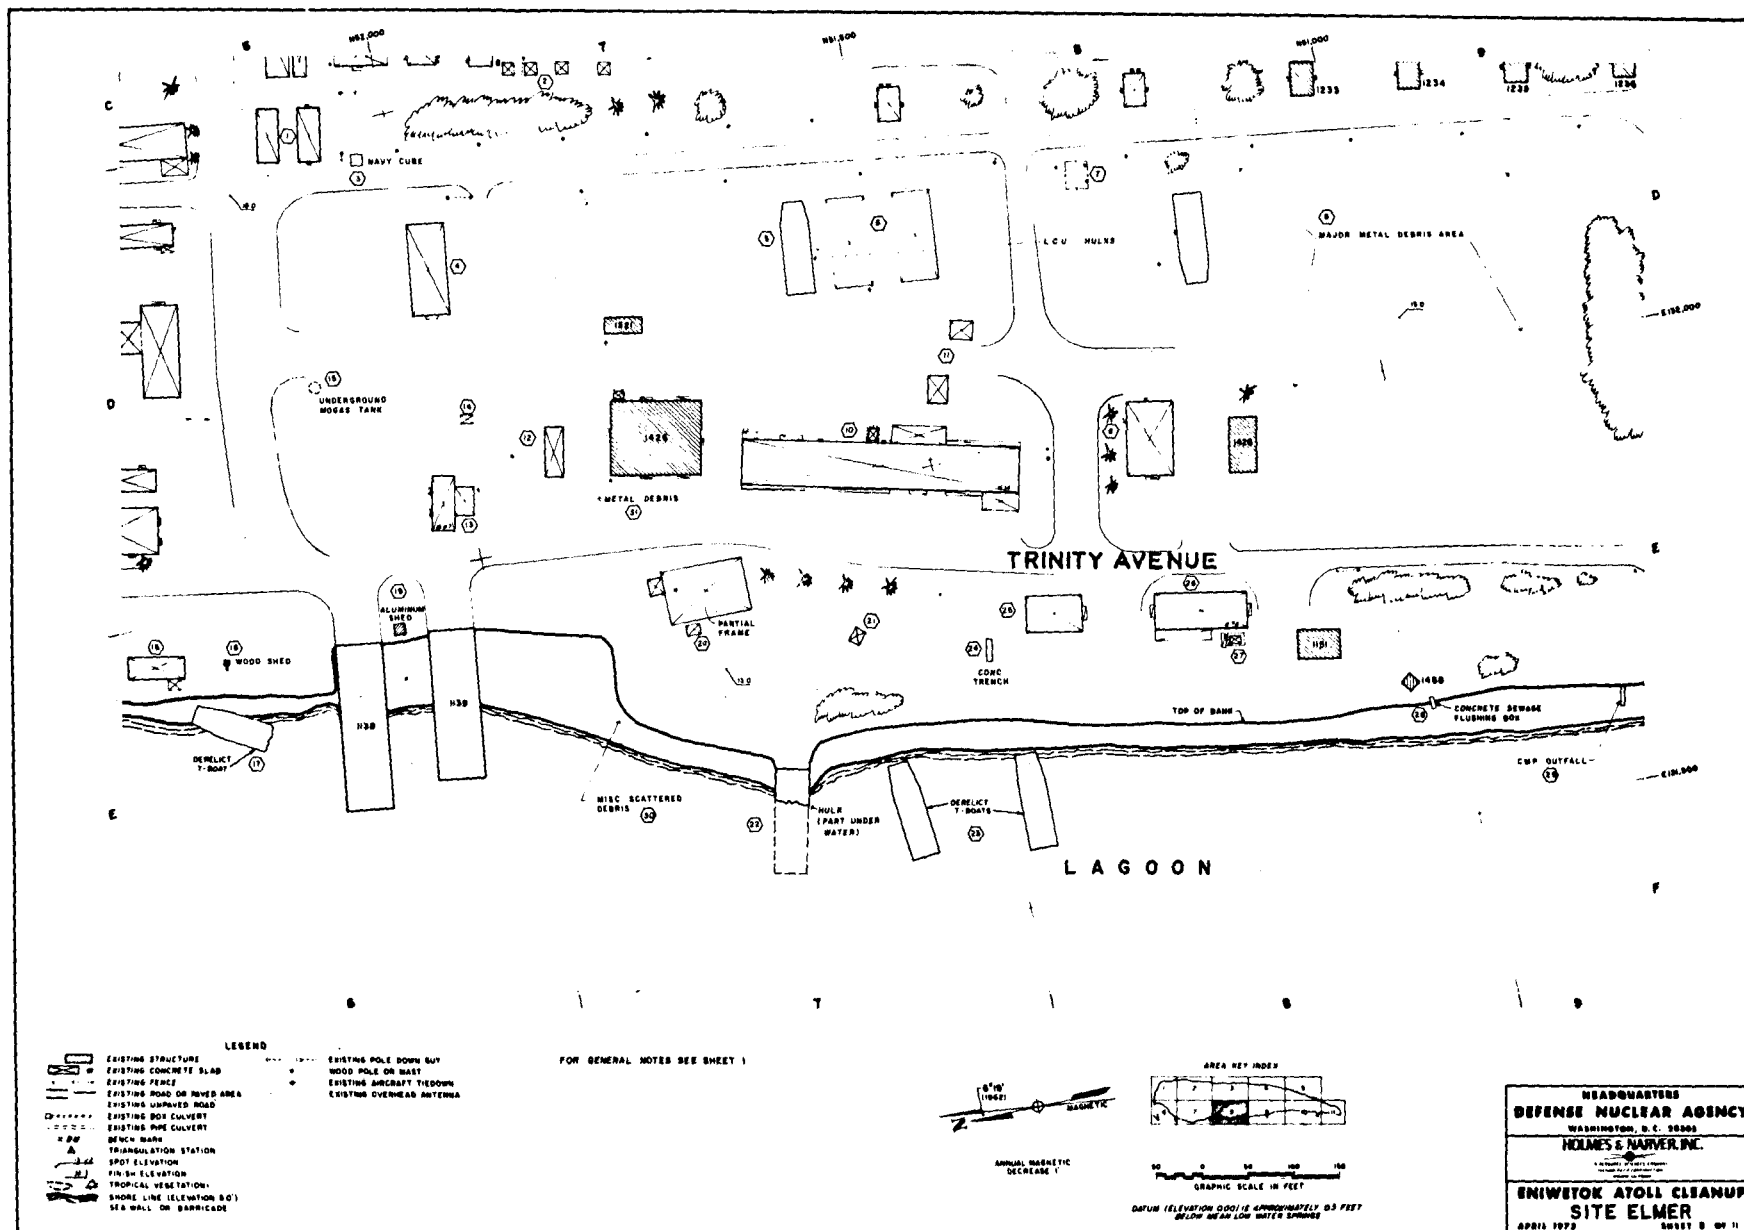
SITE ELMER, SHEET 8 OF 11
